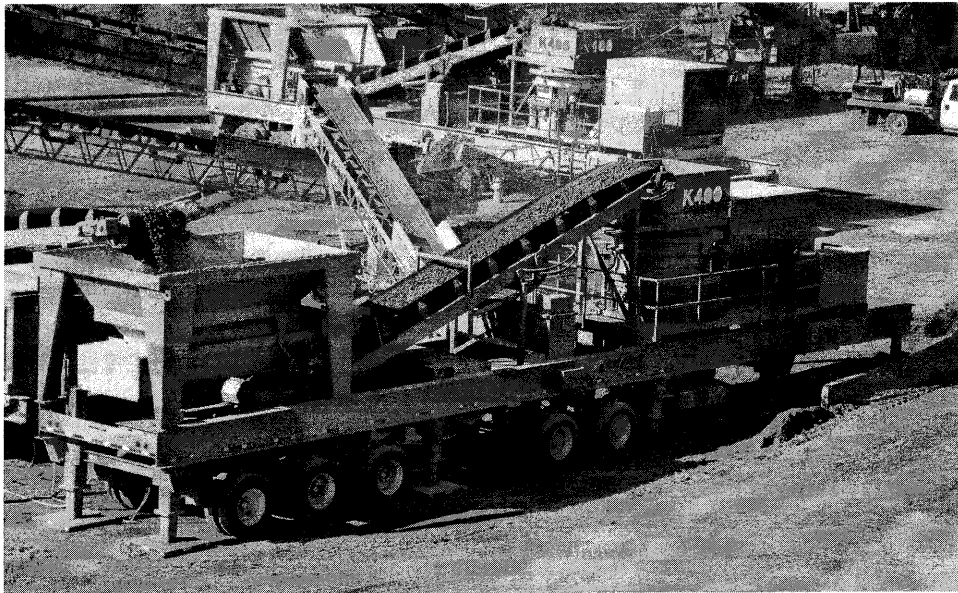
Portable recycled asphalt crushing plant. (Courtesy of Kolberg Pioneer, Inc., and Johnson Crushers International)
